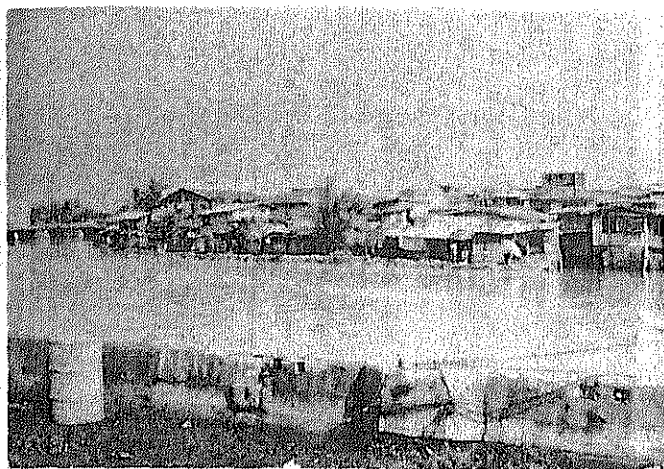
Damage to a parapet revetment in Dagupan city (on the opposite bank)
